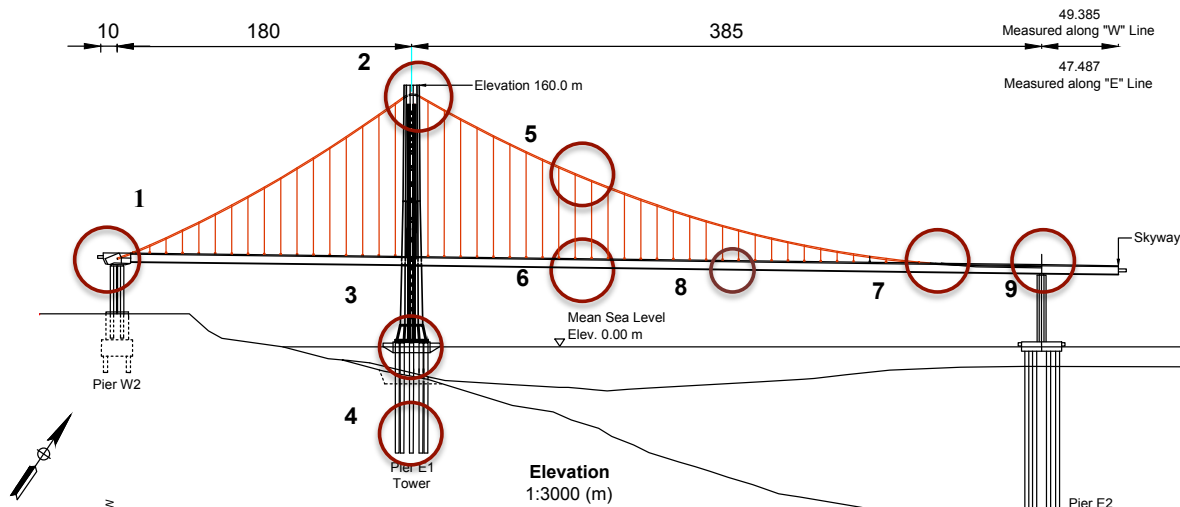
SAS bridge side view with ten highlighted locations (Ref.: AutoCAD made by the author).
